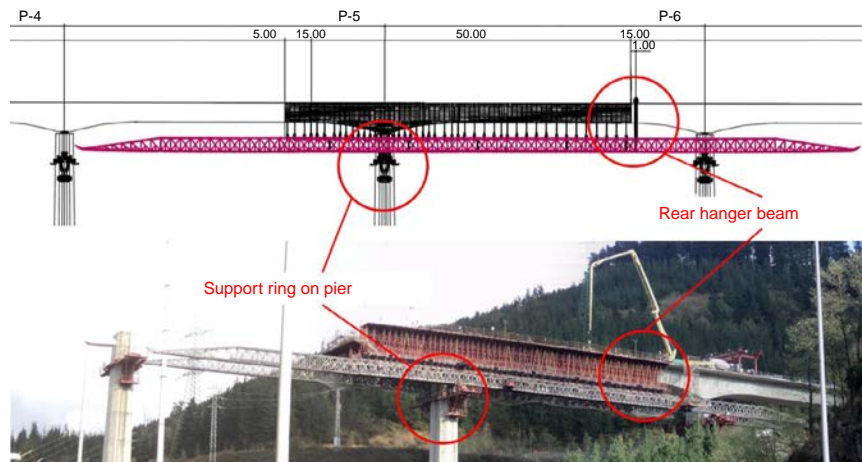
Movable scaffolding during standard concrete casting stage, resting on front ring and slung from preceding section.
